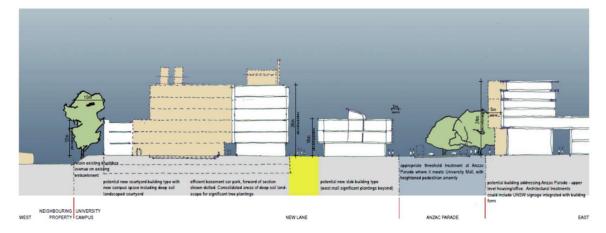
Cross Section 2-2 through Anzac Parade (Source: Randwick DCP 2013)
